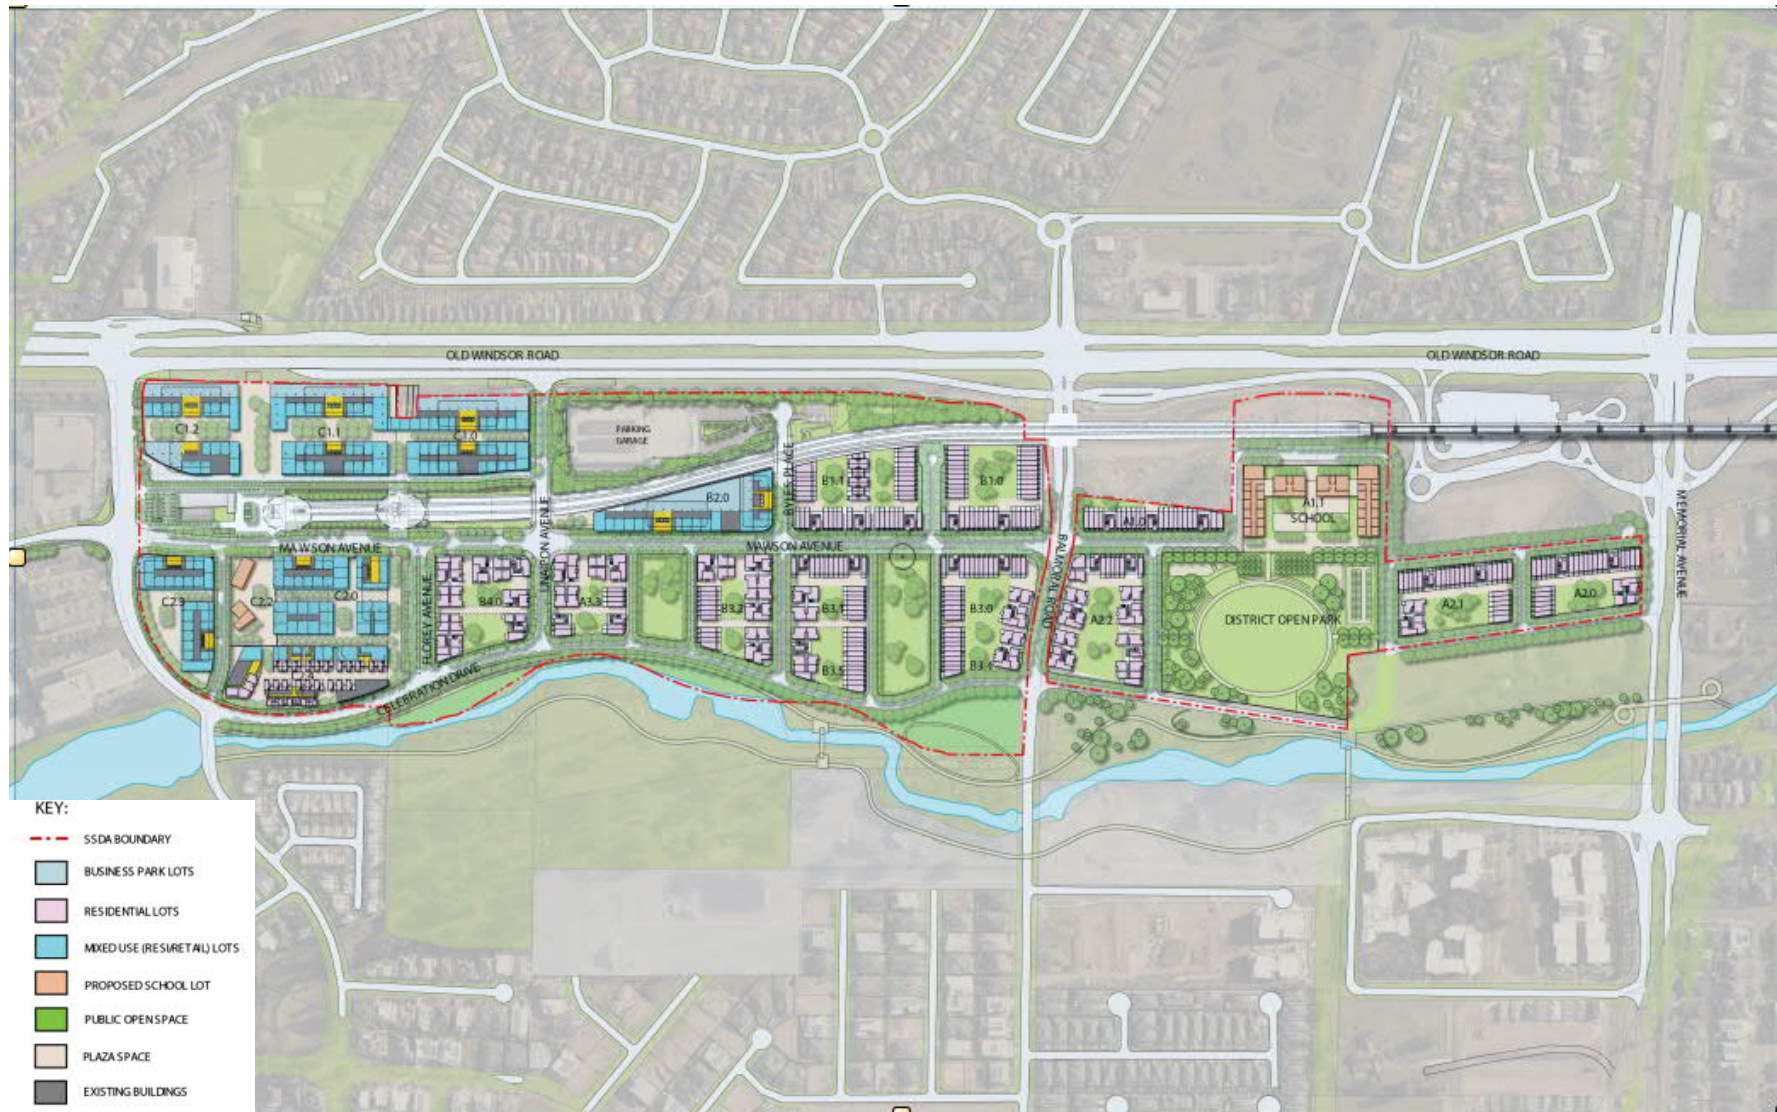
Bella Vista Masterplan (Hassell Architects)
